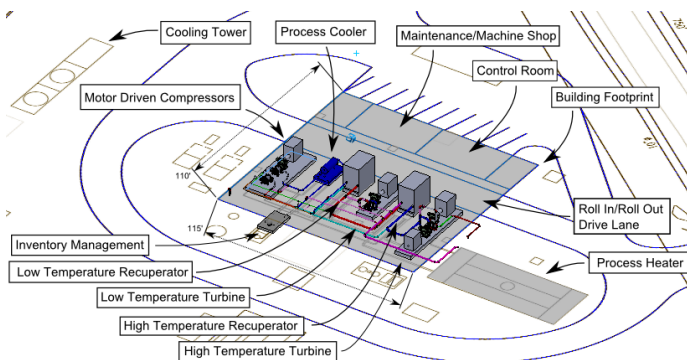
10 MWe-Scale STEP sCO₂ Test Facility Conceptual Layout
